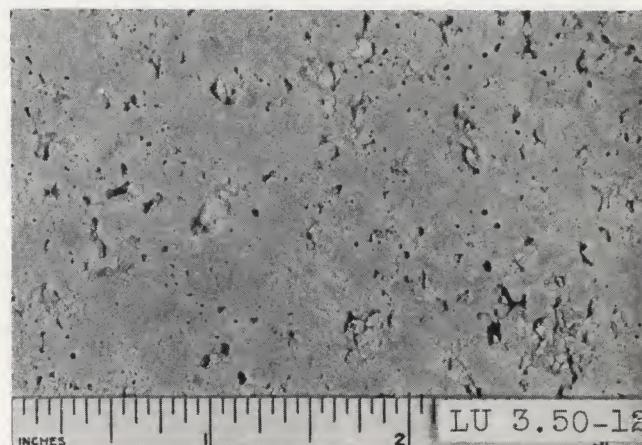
Texture of concrete masonry specimen having a low sound-absorbing coefficient.
